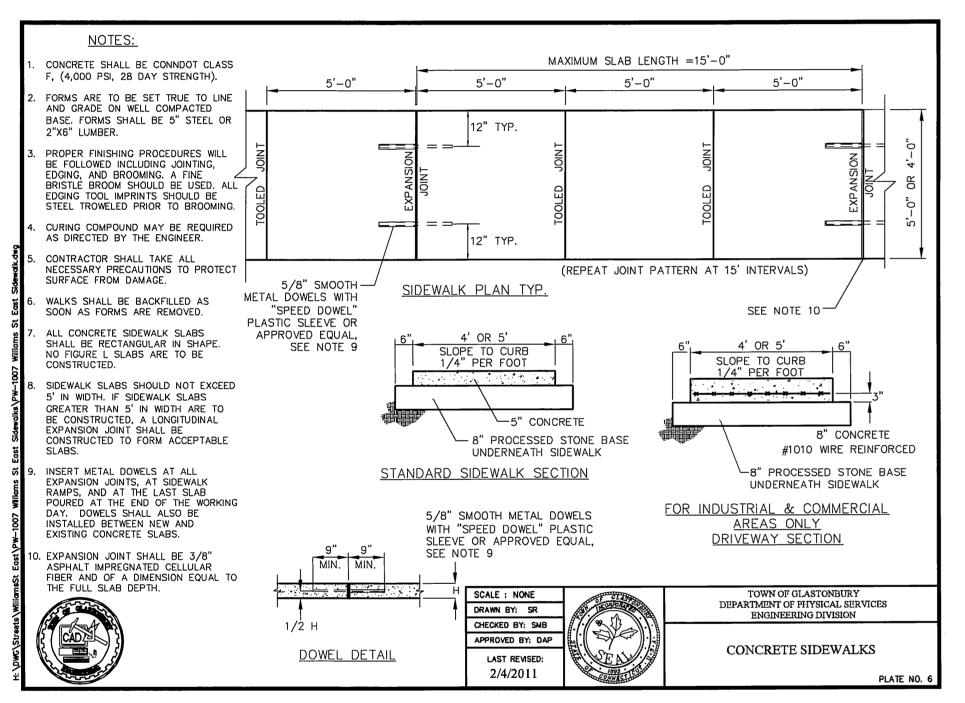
DETAILS DEPICTING PROPOSED SIDEWALK IMPROVEMENTS WILLIAMS STREET EAST GLASTONBURY, CONNECTICUT SHEET NO OF <u>7</u>
